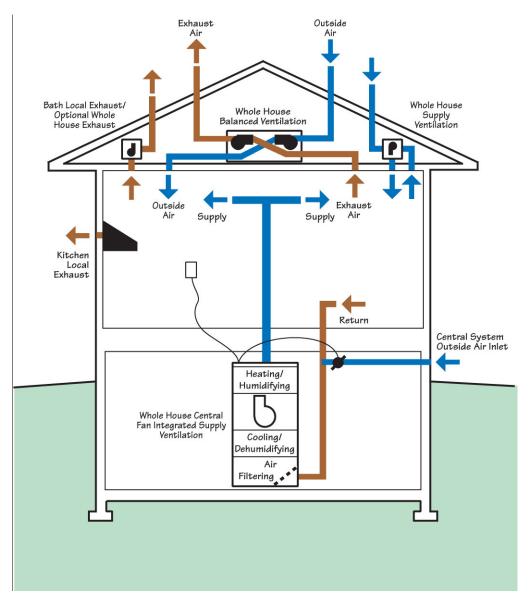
Schematic overview of typical local and whole-house ventilation equipment (a home typically has only one whole-house system)
